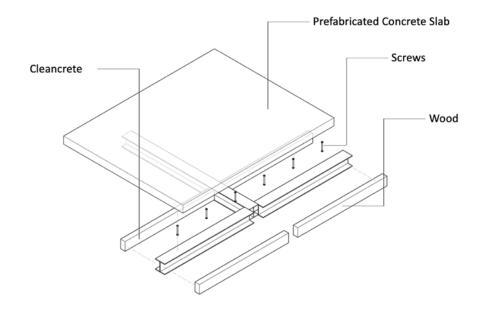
AXONOMETRIC VIEW OF THE PROPOSED DISASSEMBLE CONCRETE FLOOR-STEEL STRUCTURE APPROACH. @ZHAW
